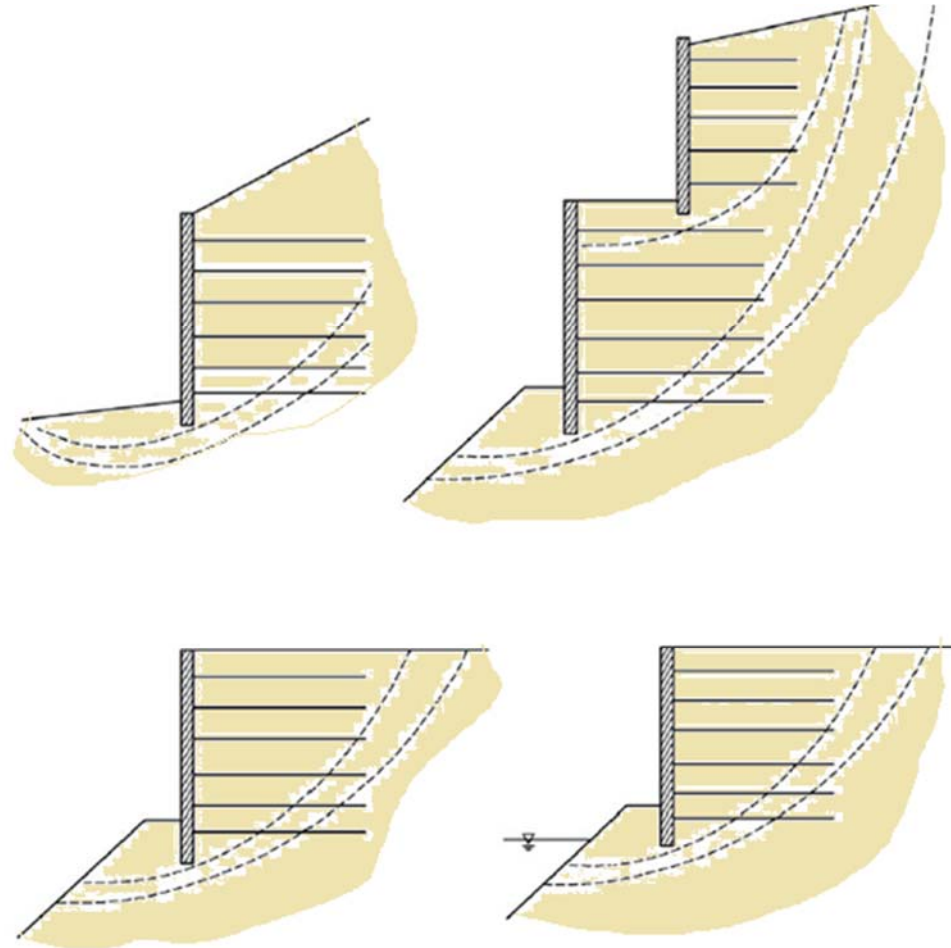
Potential external failure mechanisms for a MSE wall.
